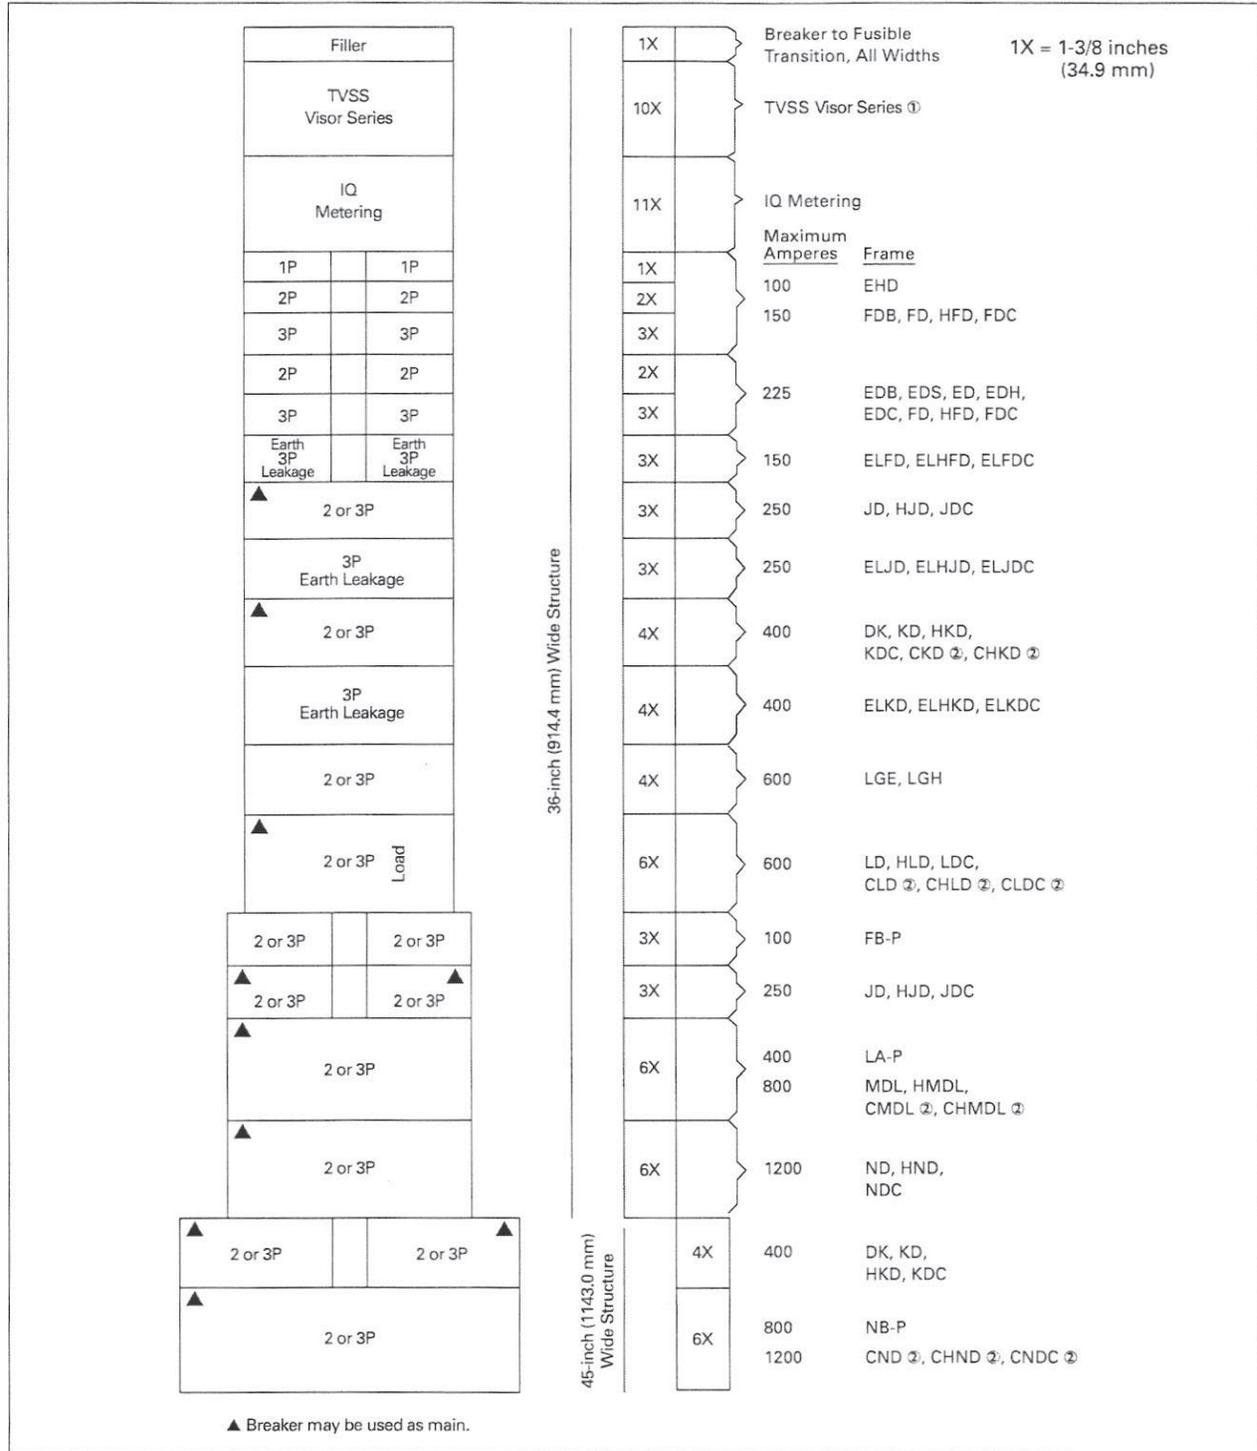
Circuit Breaker "X" Space Requirements — Dimensions in Inches (mm)
